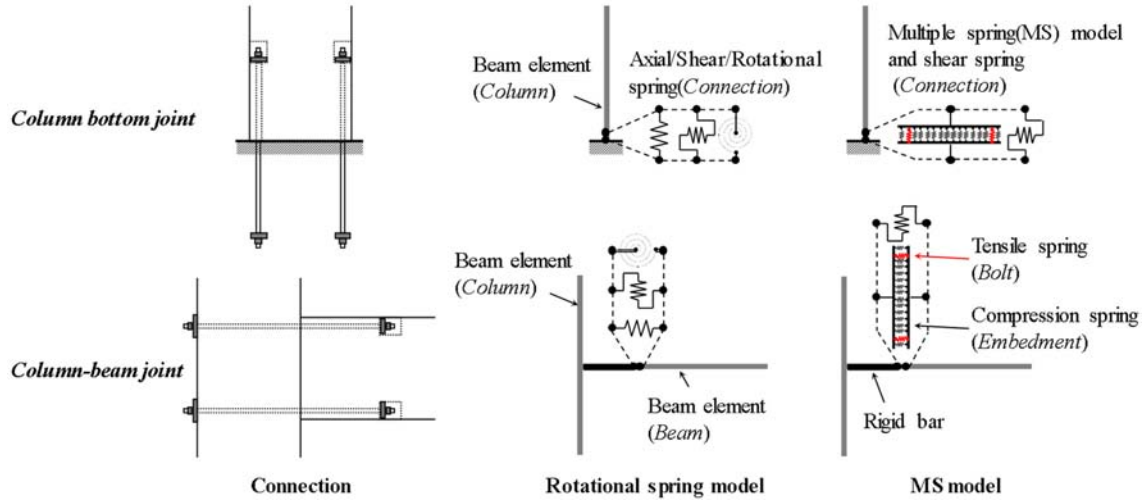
Framing models of wooden connections. (An example of tensile-bolted joint)
